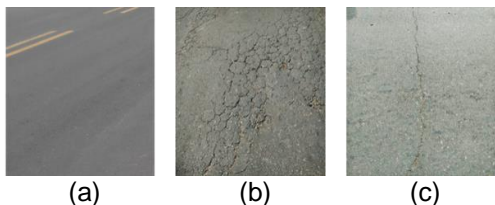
(a) Non crack (b) alligator crack (c) linear crack
